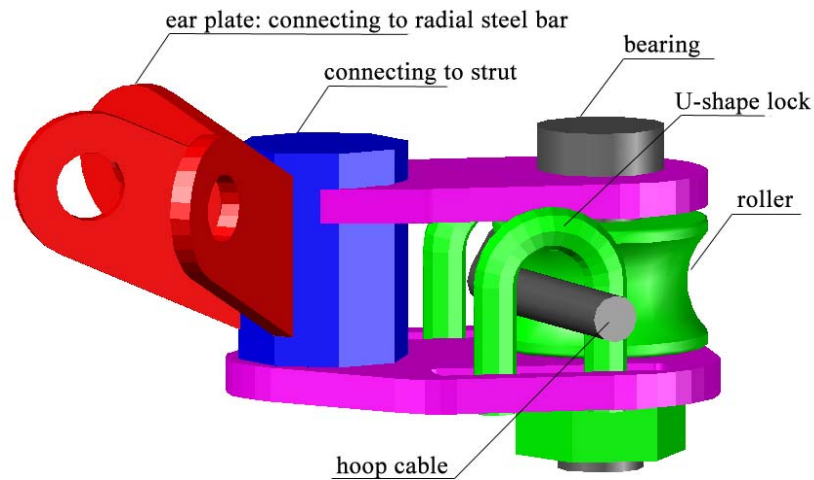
Assembly Drawing of the Rolling Cable-strut Joint
